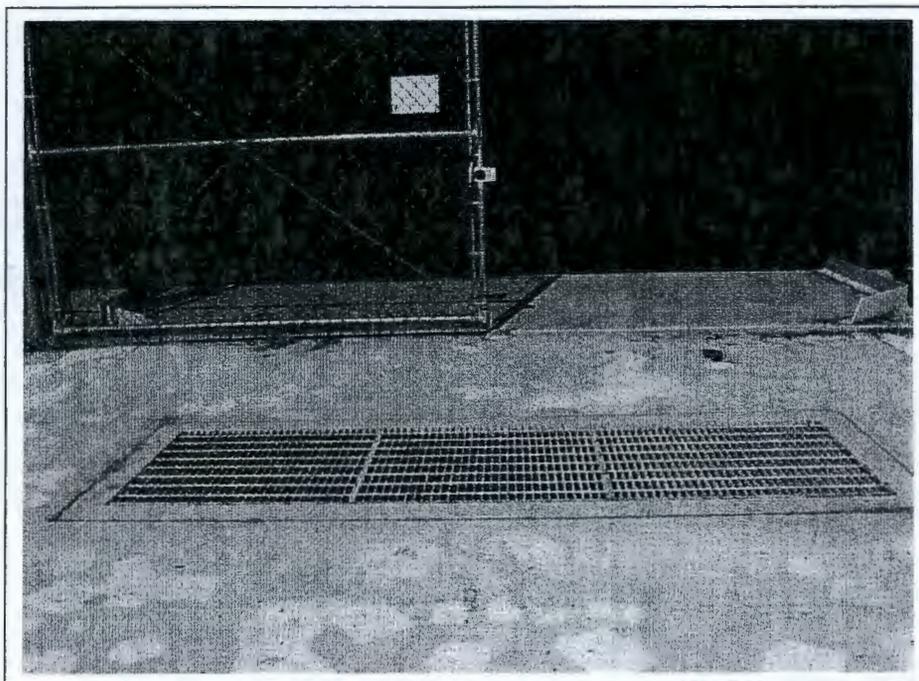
View toward the west showing outdoor collection sump and Cell 10.
